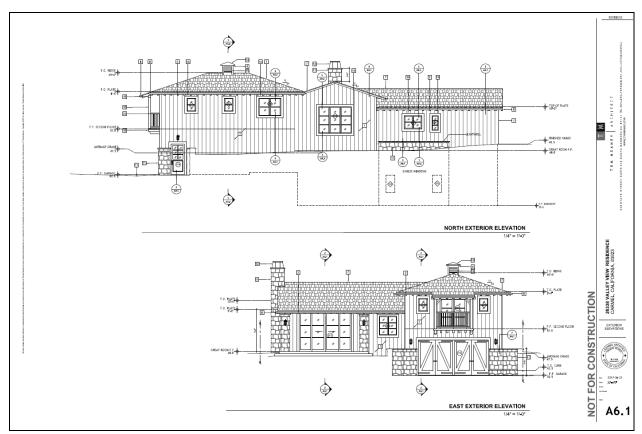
Elevations: Proposed Elevations 26338 Valley View Avenue (north and east exterior elevations).
